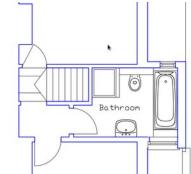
Showing the unusual step arrangement on the stairs leading to the bedrooms
